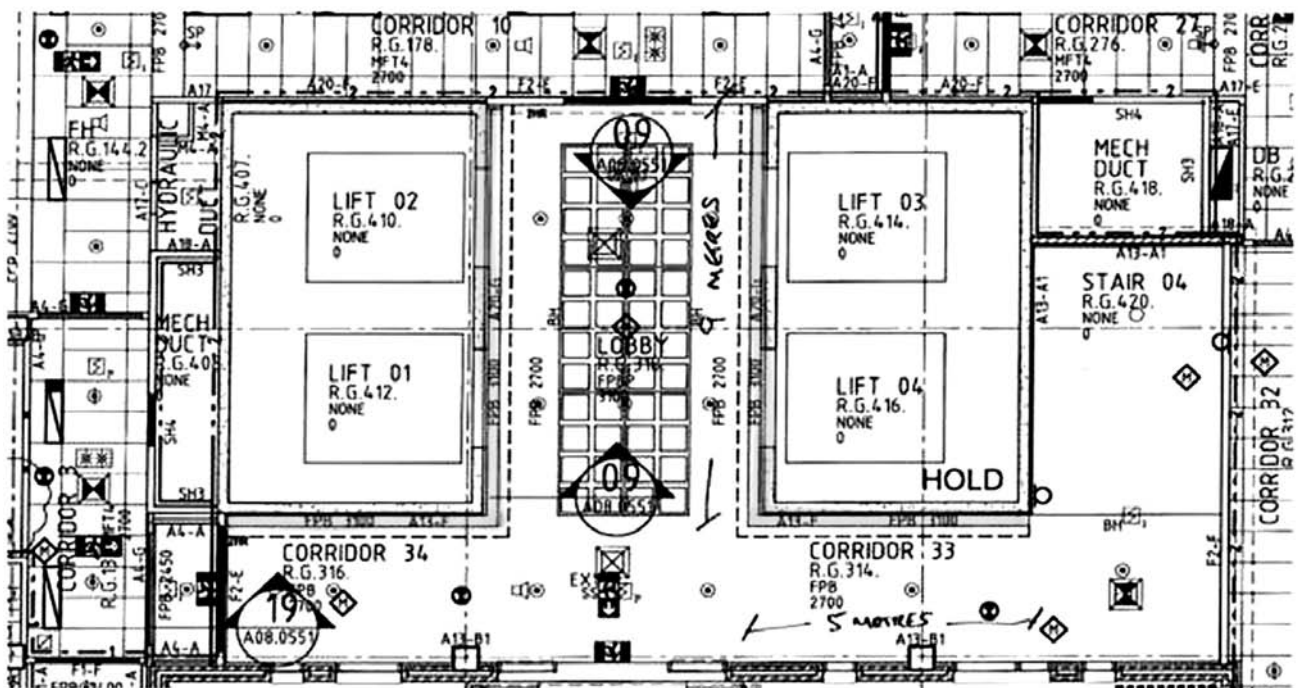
Floor plan, lift area, ground floor, with position of panelling indicated by green shading
